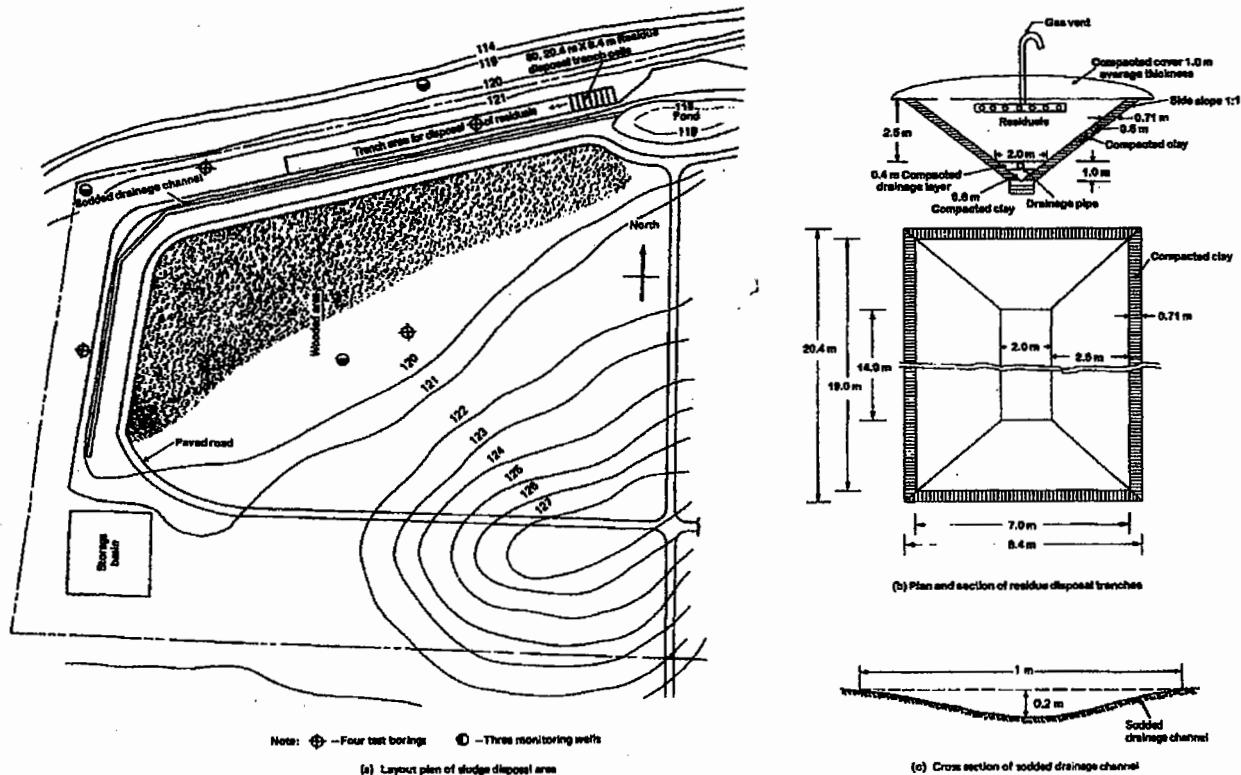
Layout Plan and Design Details of Trenches for Sludge Disposal.
